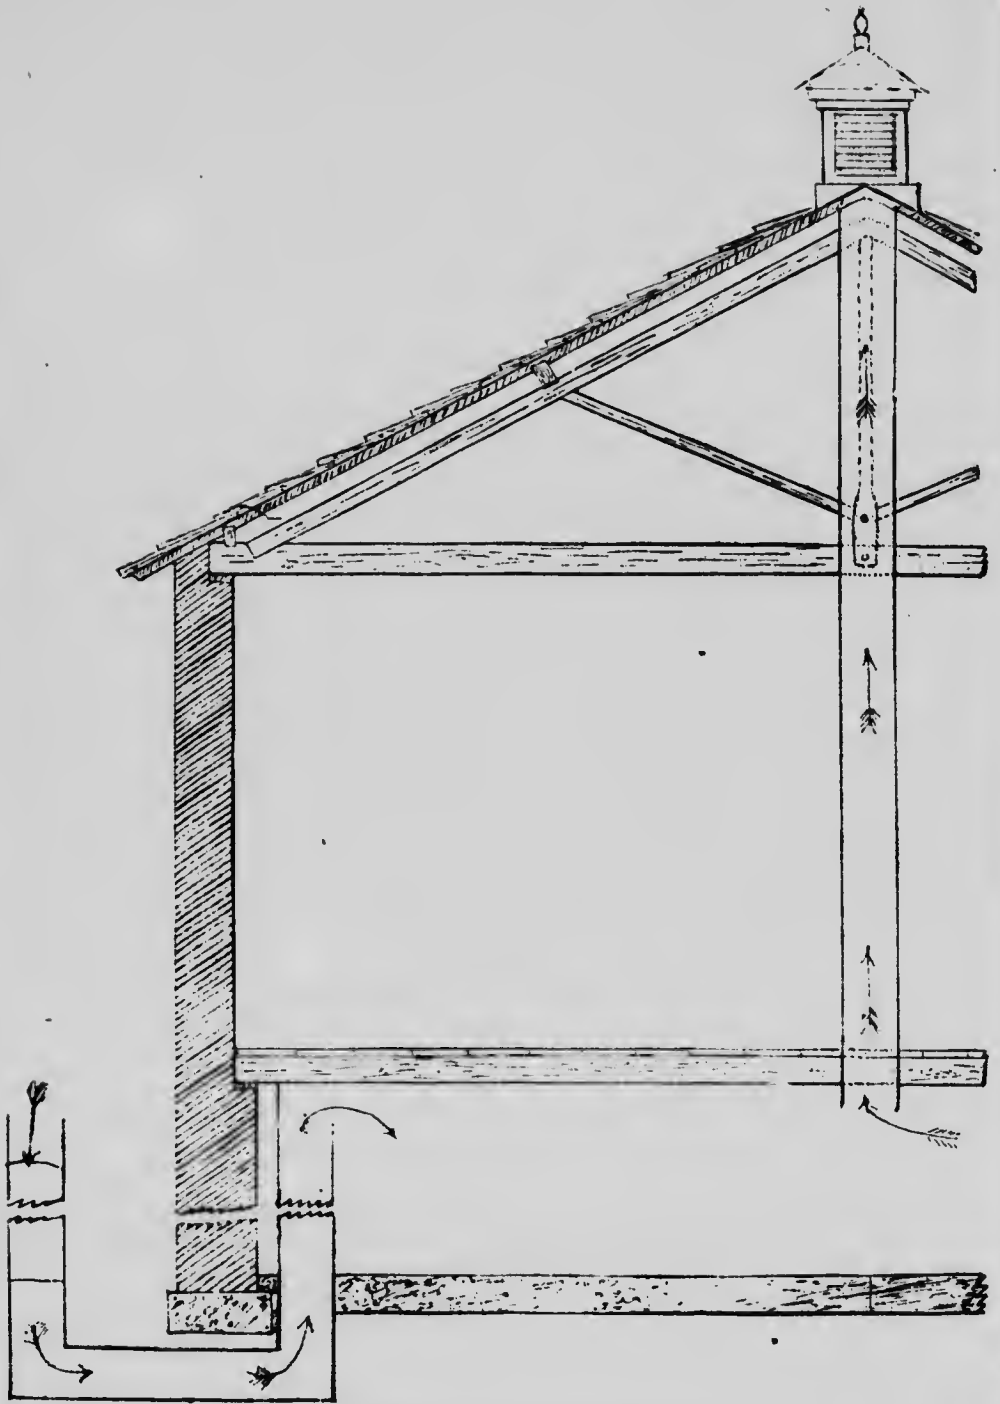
Dr. Rutherford's plan of ventilation—U pipes.
